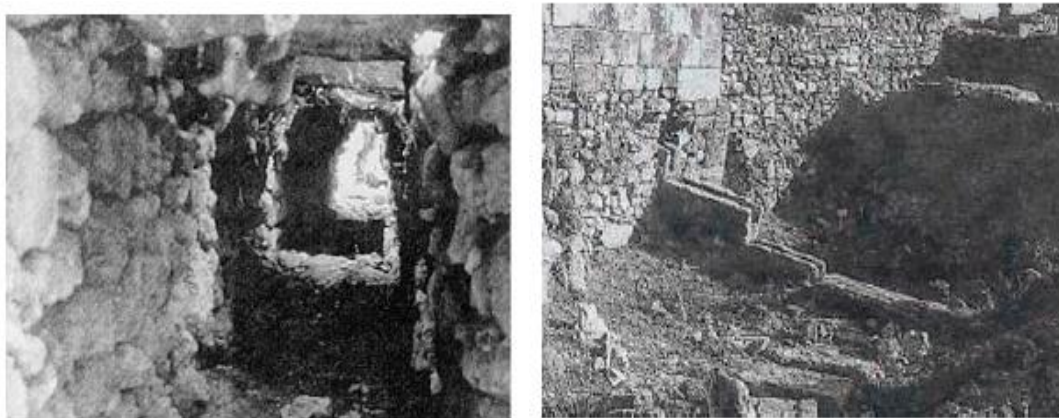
Underground sewer system - Interior b) Canals build through the walls of buildings constructed to discharge wastewater [15]
